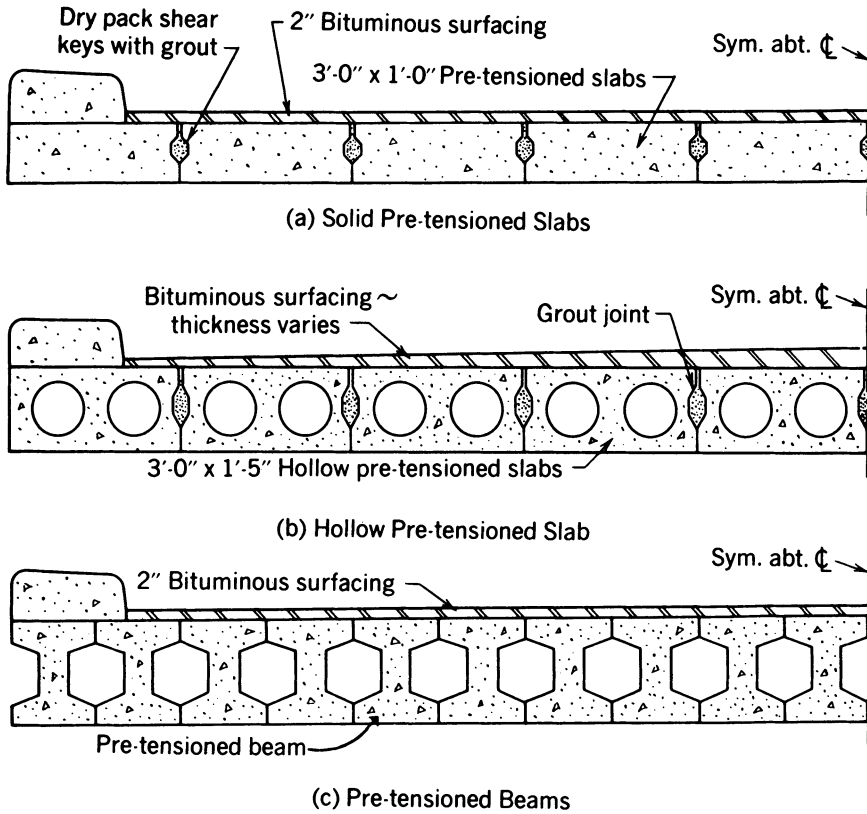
Half-sections of typical prestressed-concrete short-span bridges.
